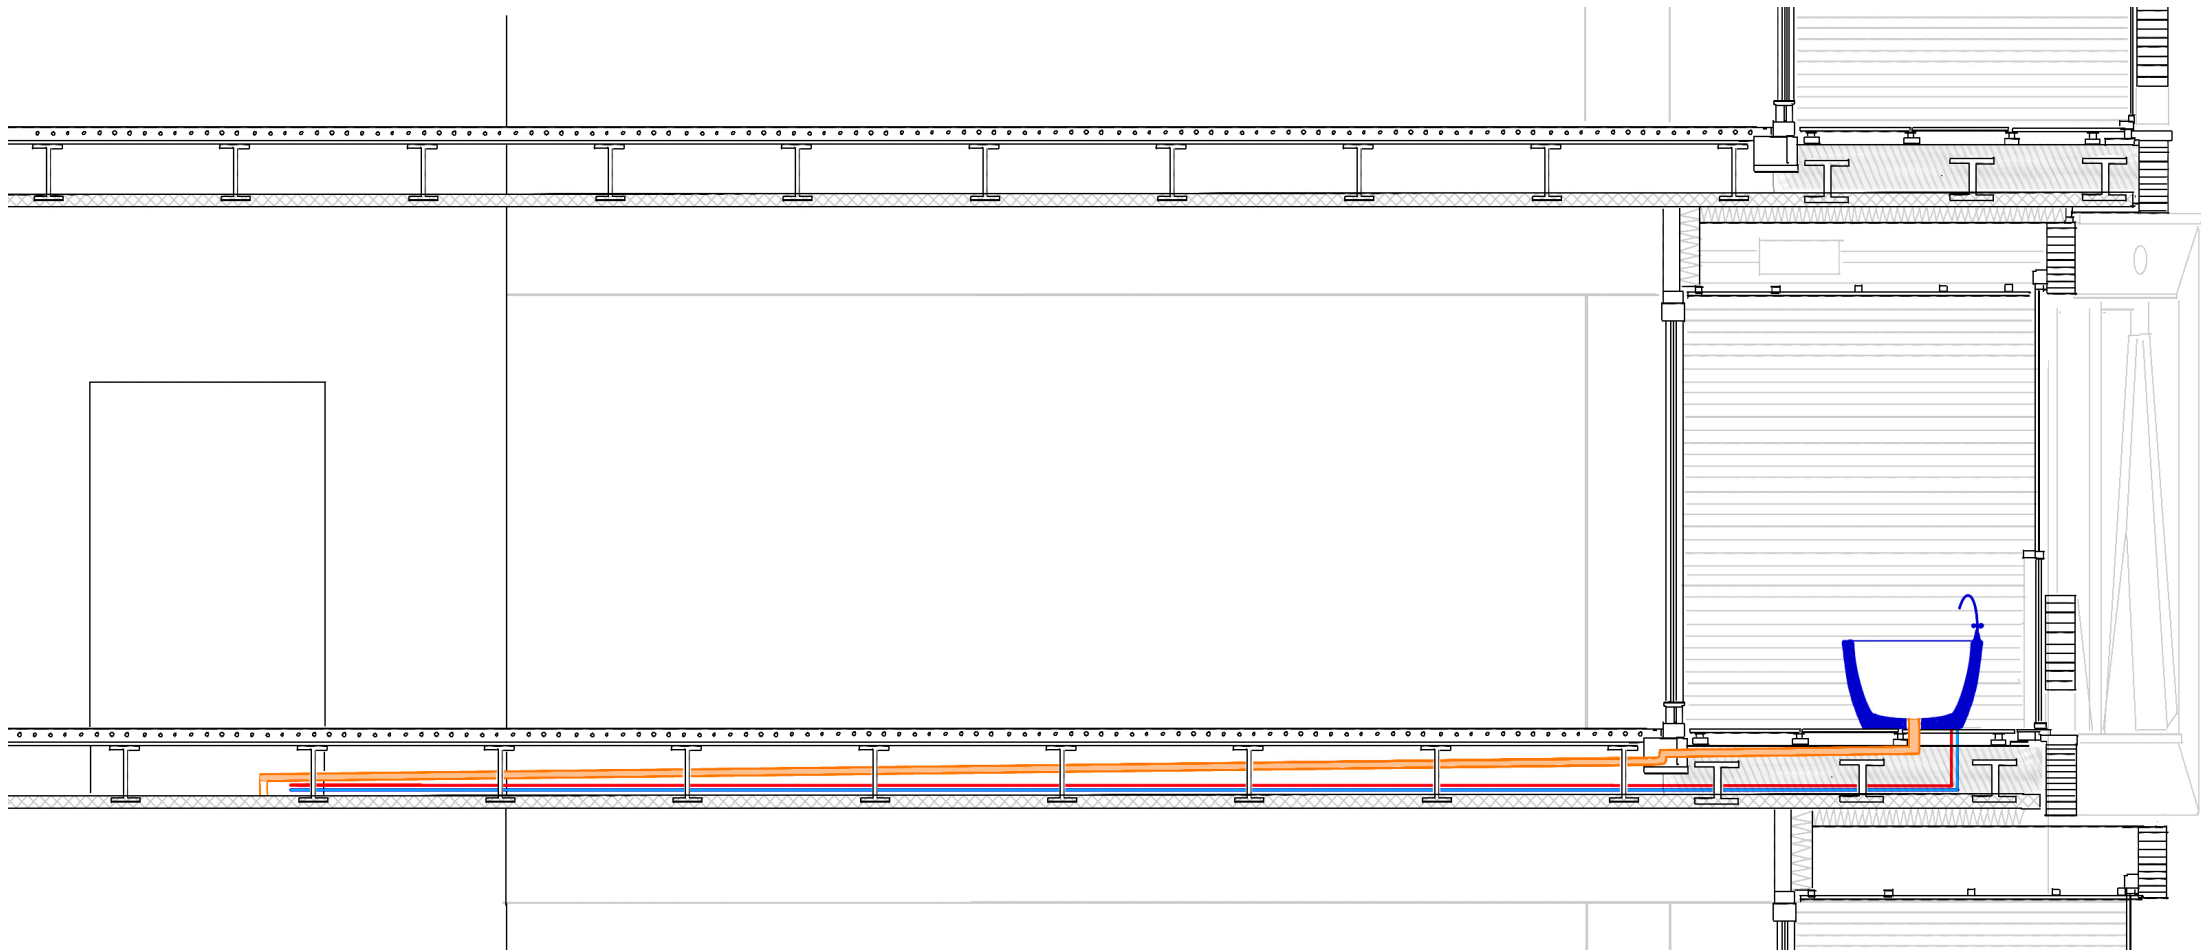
Relation between floorheight and slope requirement for wastewater drainage. (Own work)
